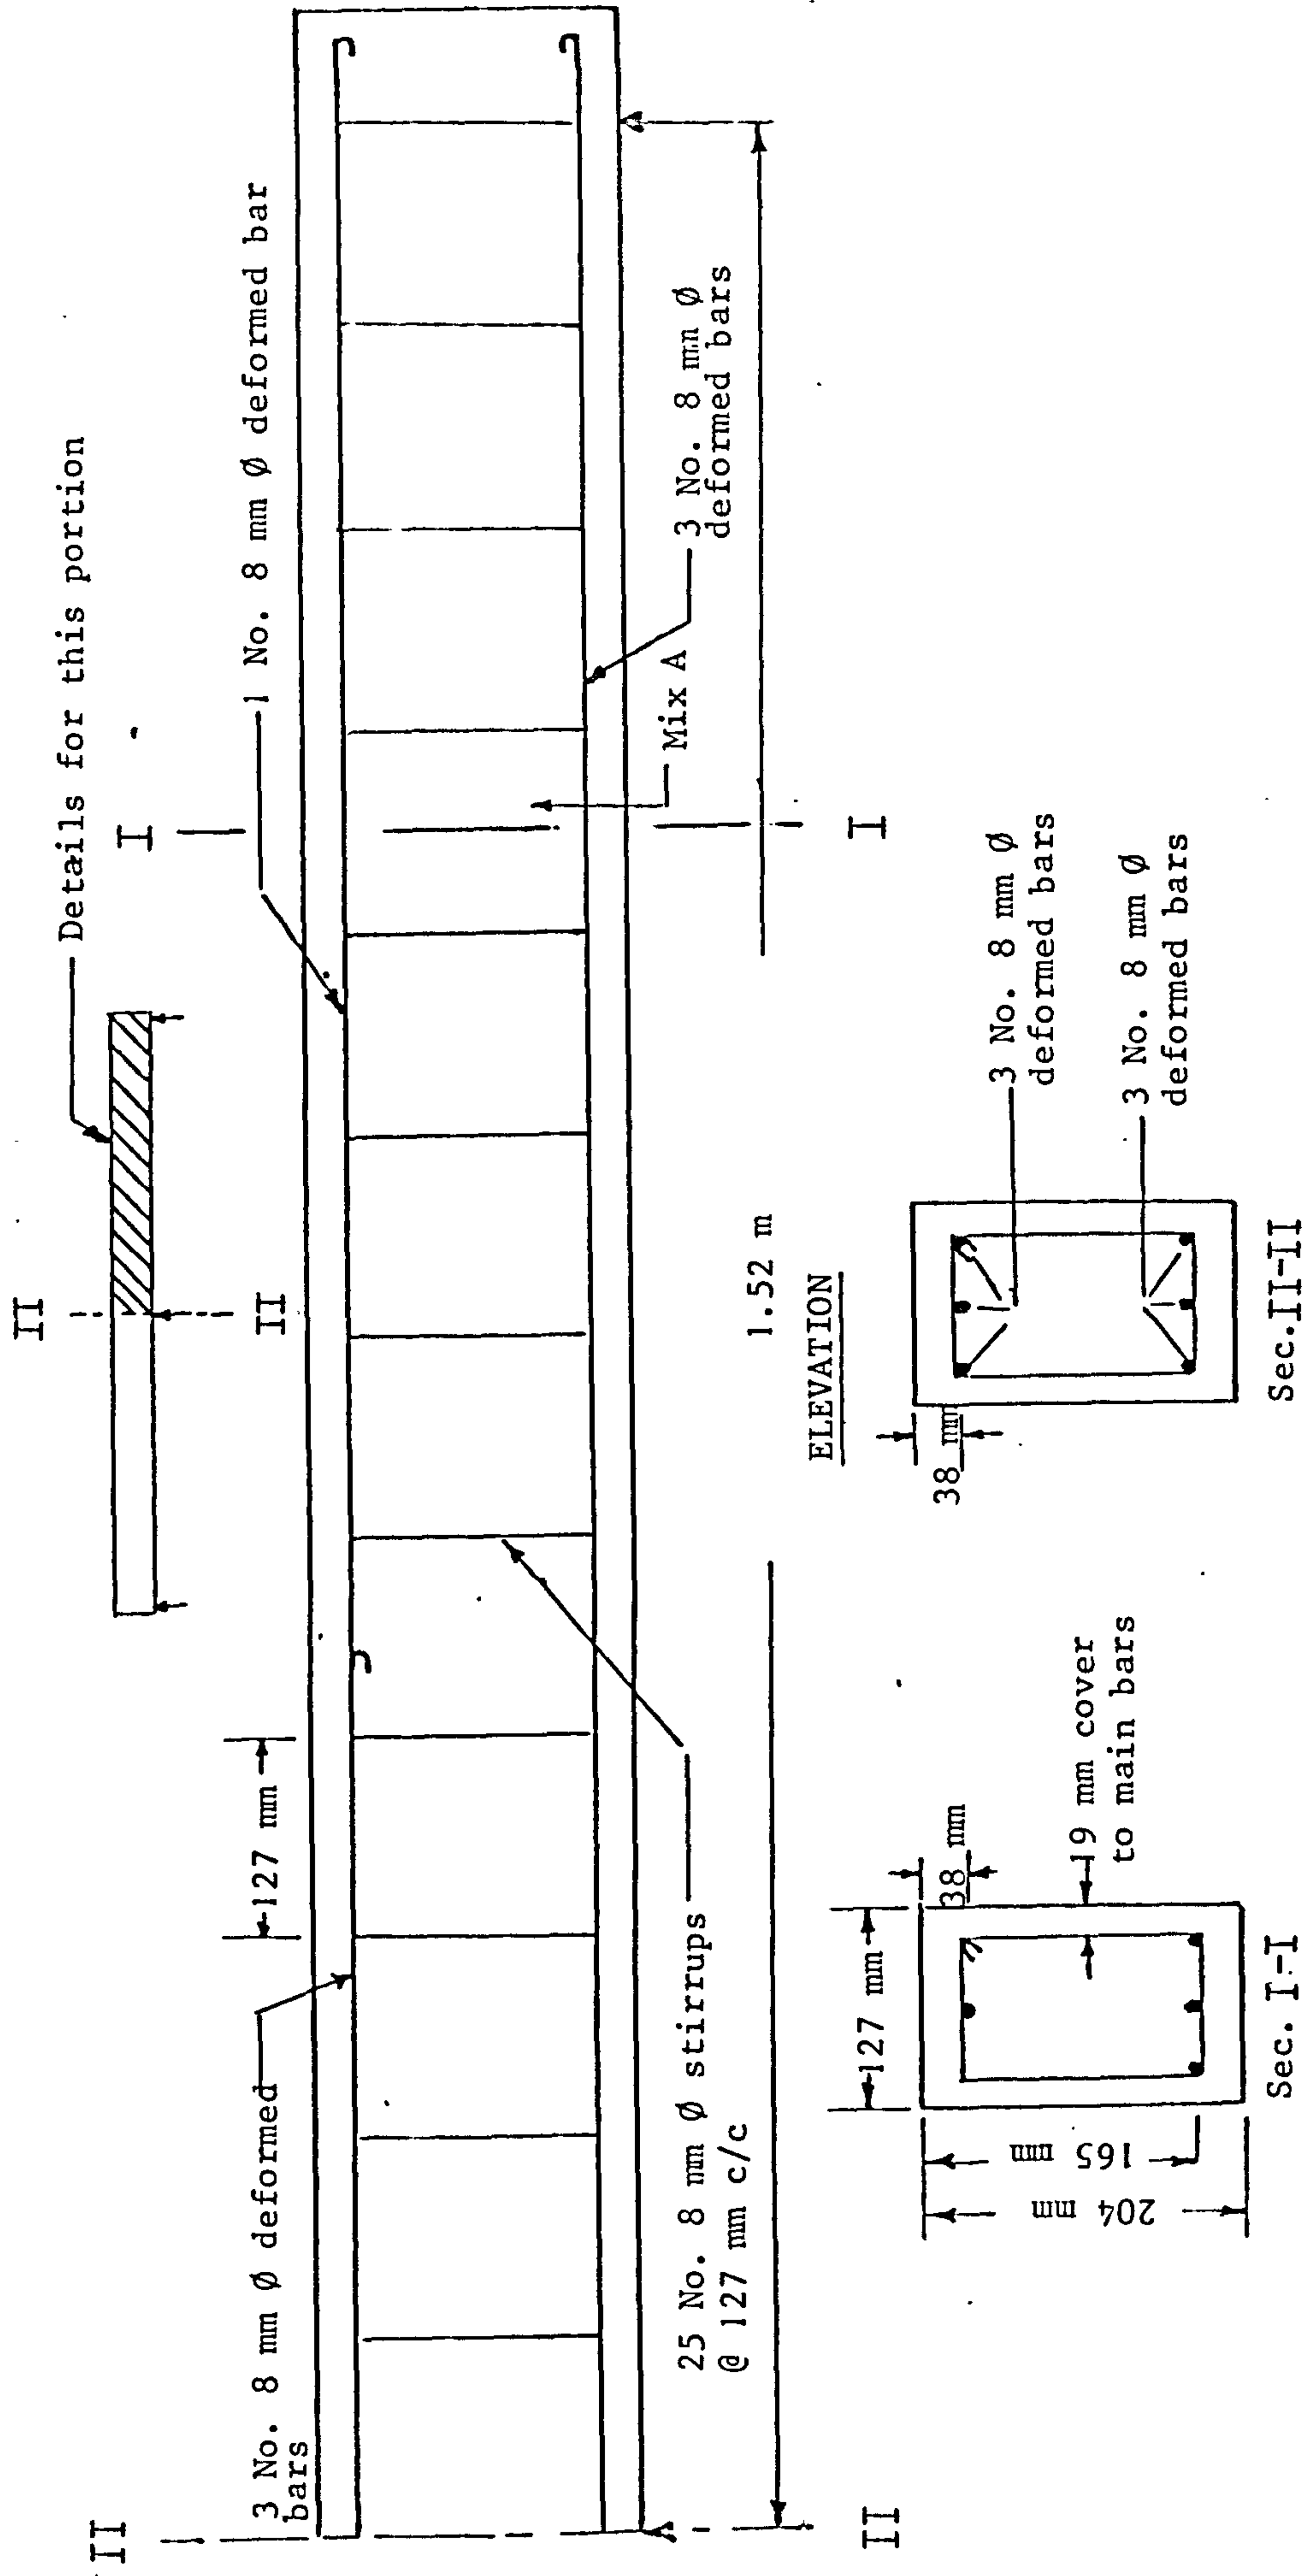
Diagram showing reinforcement in reinforced concrete continuous beam
